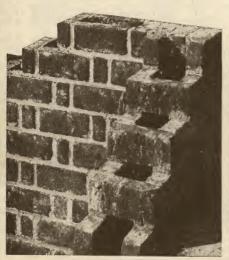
° Ideal all-rolok wall. Note its attractive appearance and sturdy construction.
